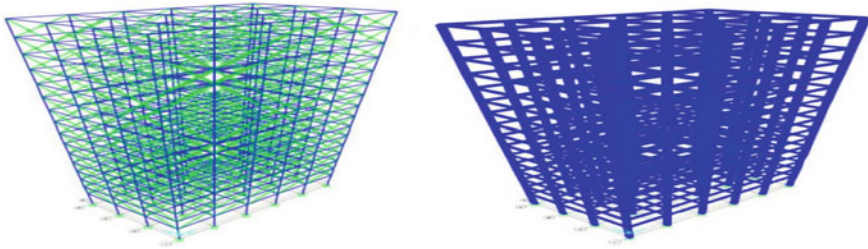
3D view of G+15 storey building with bare frame and with infill wall
